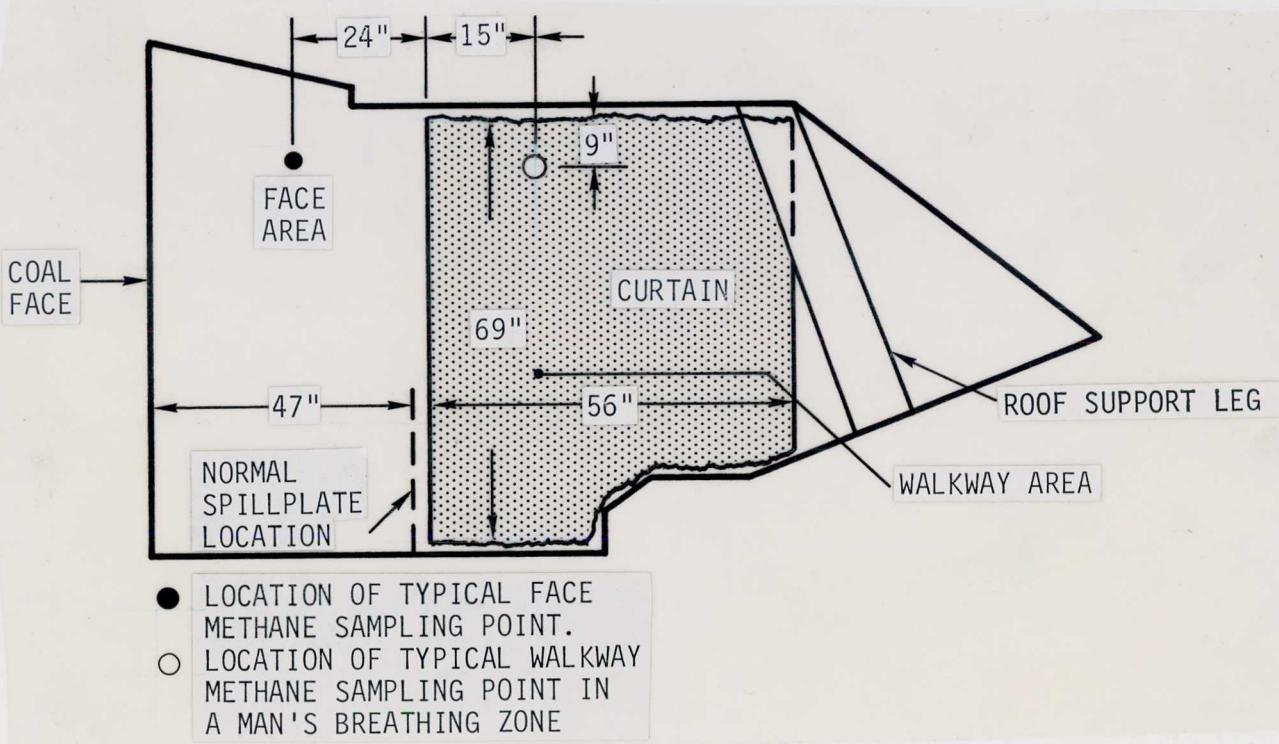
Walkway curtain installation - section view of longwall gallery.
